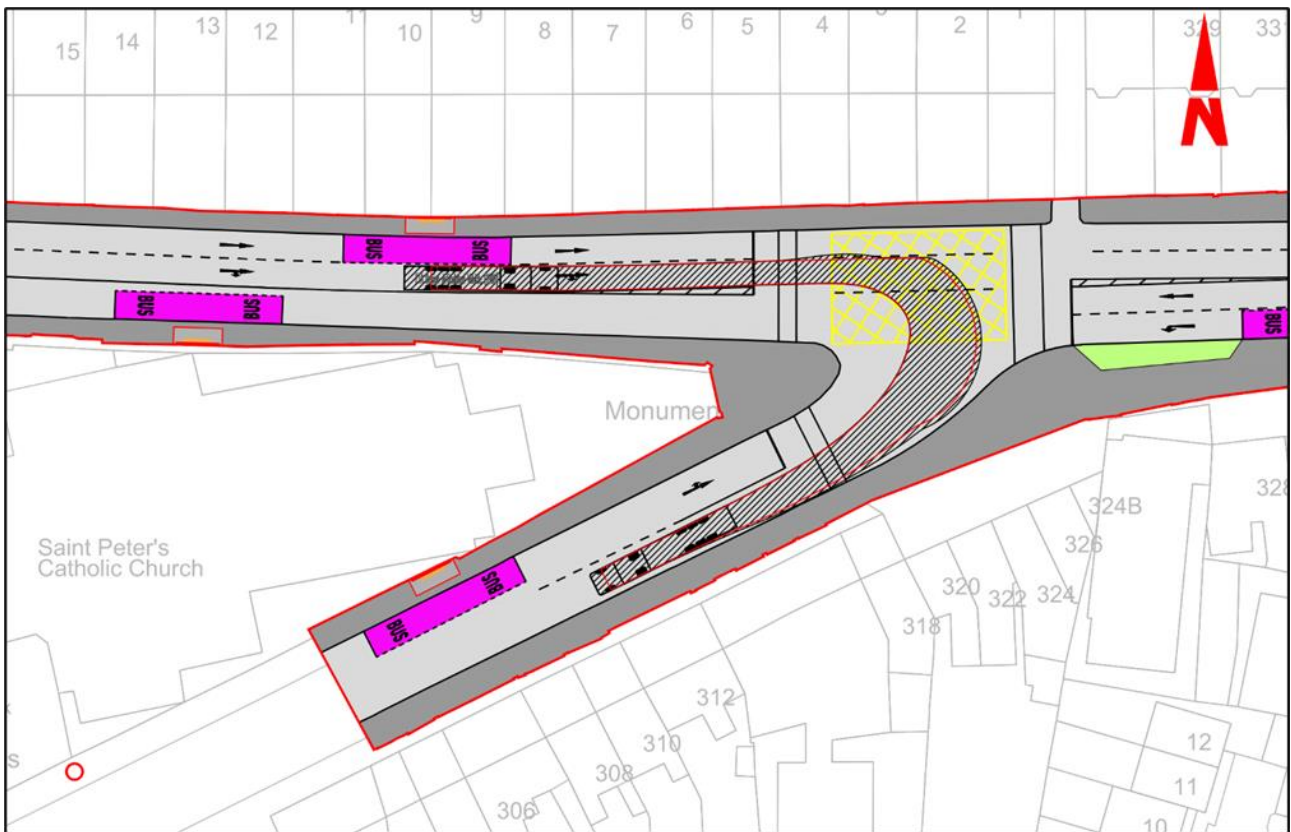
Swept path of HGV from Cabra Road travelling southwest bound onto North Circular Road
